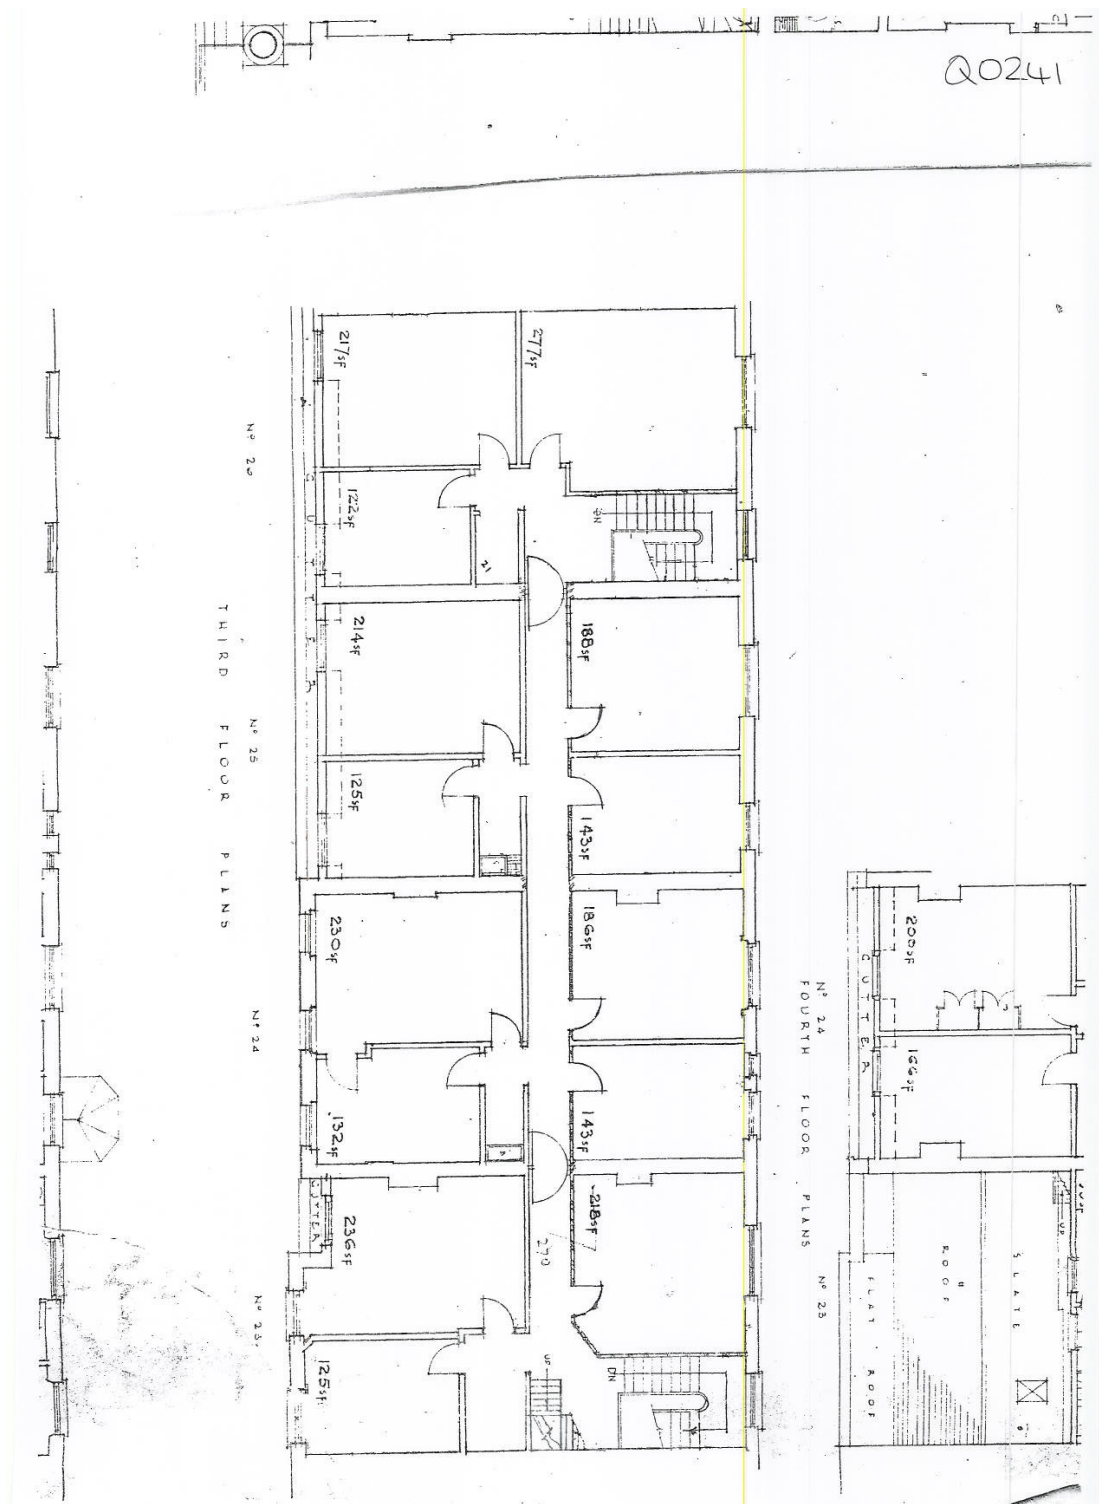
Extract from Ministry of Works Plans April 1946 Third Floor Plans Nos: 26 – 23 Chester Terrace – The Crown Estate Archives
